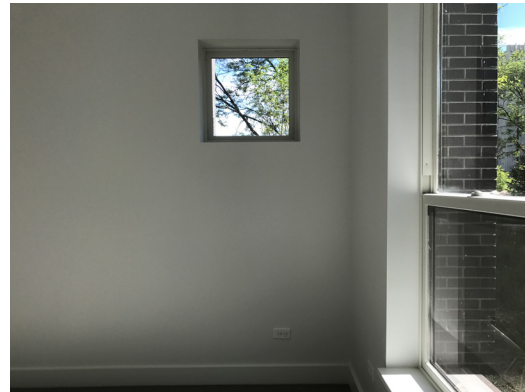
Interior Elevation of 1620 Central Wall Under Investigation.
